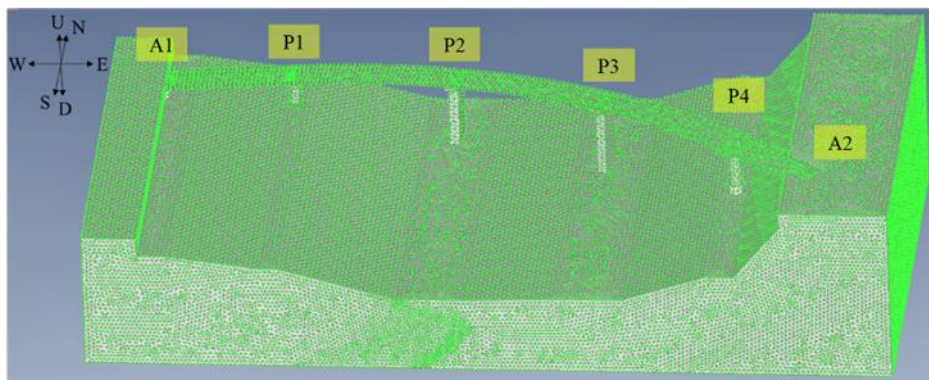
3D FE model of bridge structure-underground interconnected system of Ohkiriata Bridge
